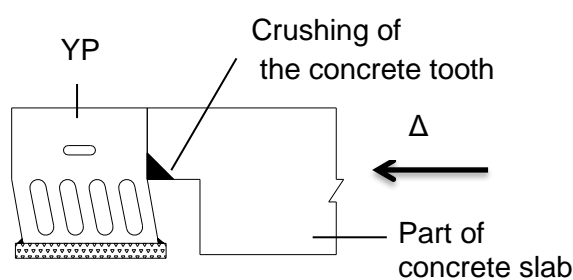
Push out specimen SP6 at the end of test (closer view)
